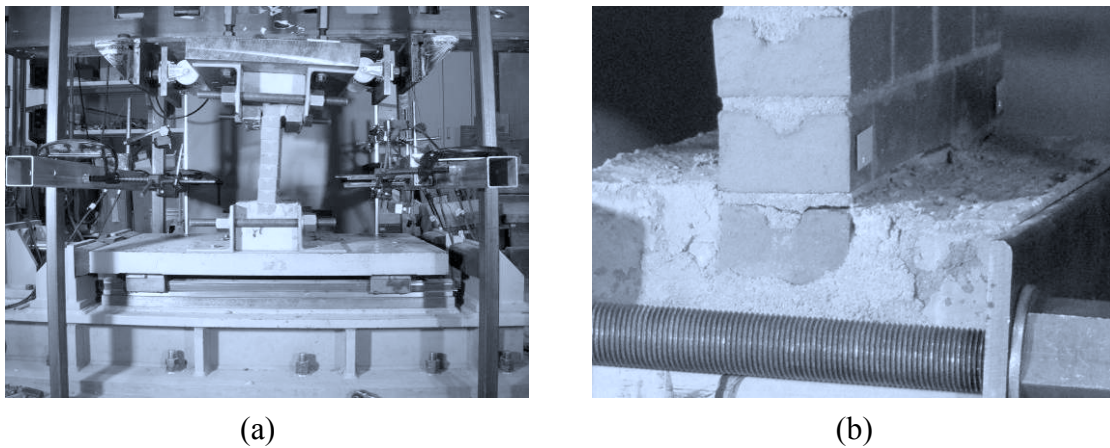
Deformed shapes for the URM specimen: (a) deformed shape, (b) bed joint cracking.
